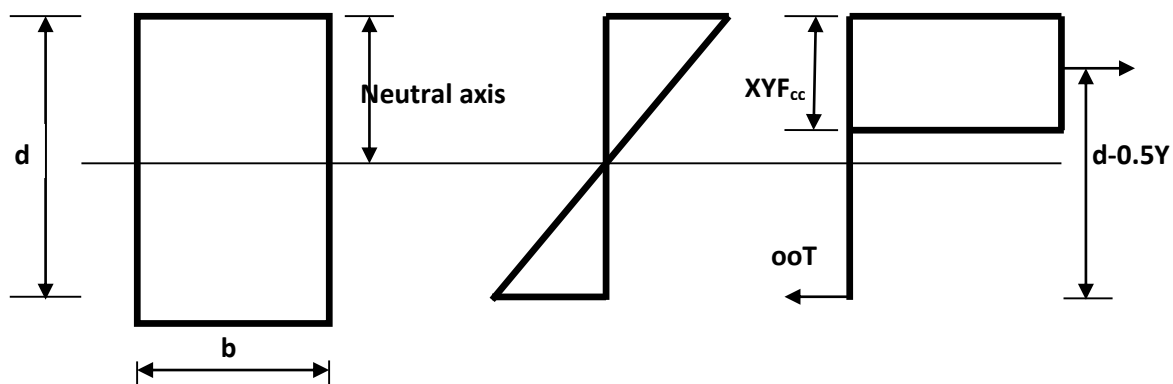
Singly Reinforced Concrete Section with Rectangular Stress Block
